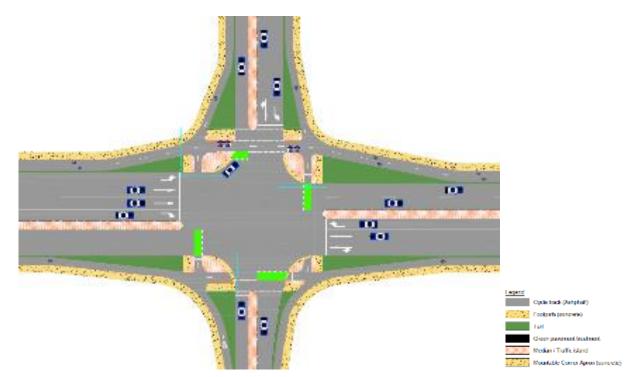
Typical Layout at Signalised 4-way Intersection
